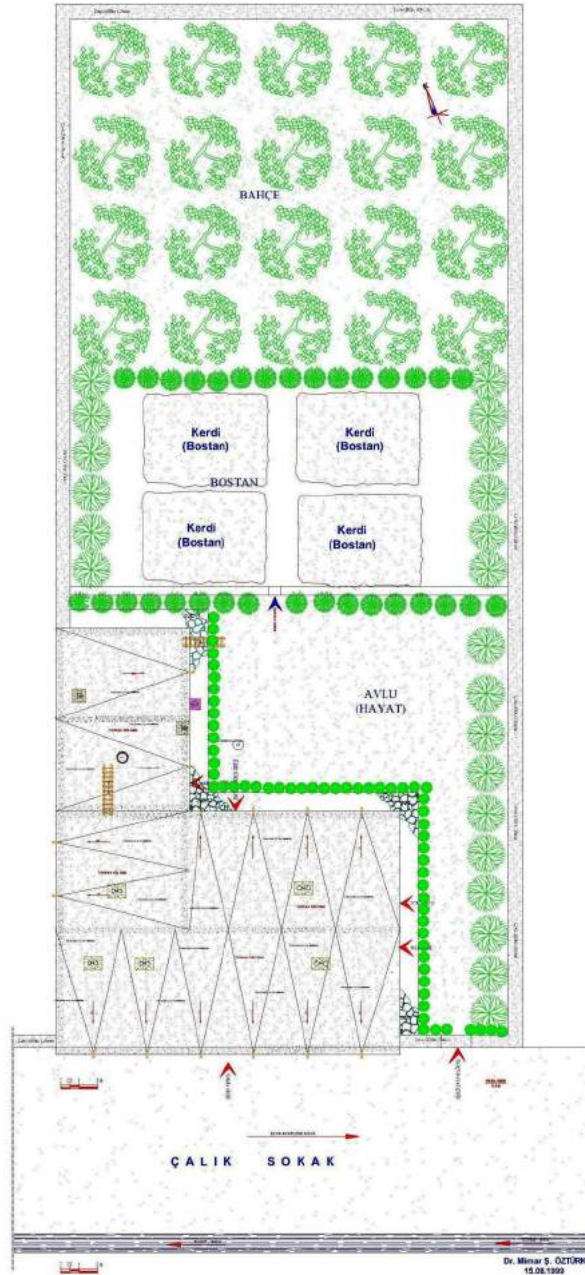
Polat Yörükoğlu House Condition Restitution Plan, drawn by author.
